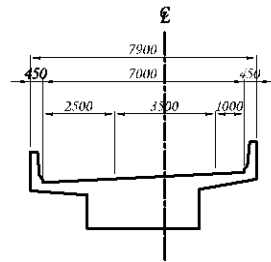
Typical Cross Section for Ramp (1-lane, Bridge)
